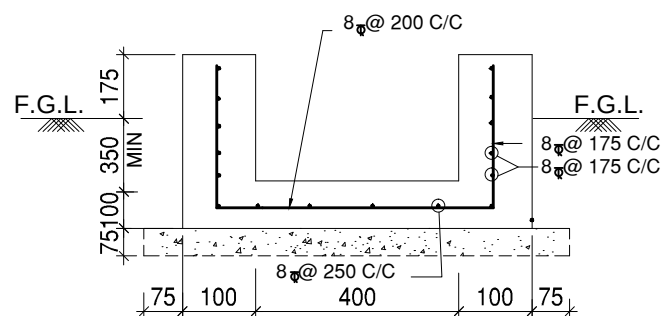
(DETAIL OF TRENCH COVER FOR SECTION B-B, C-C & D-D)
